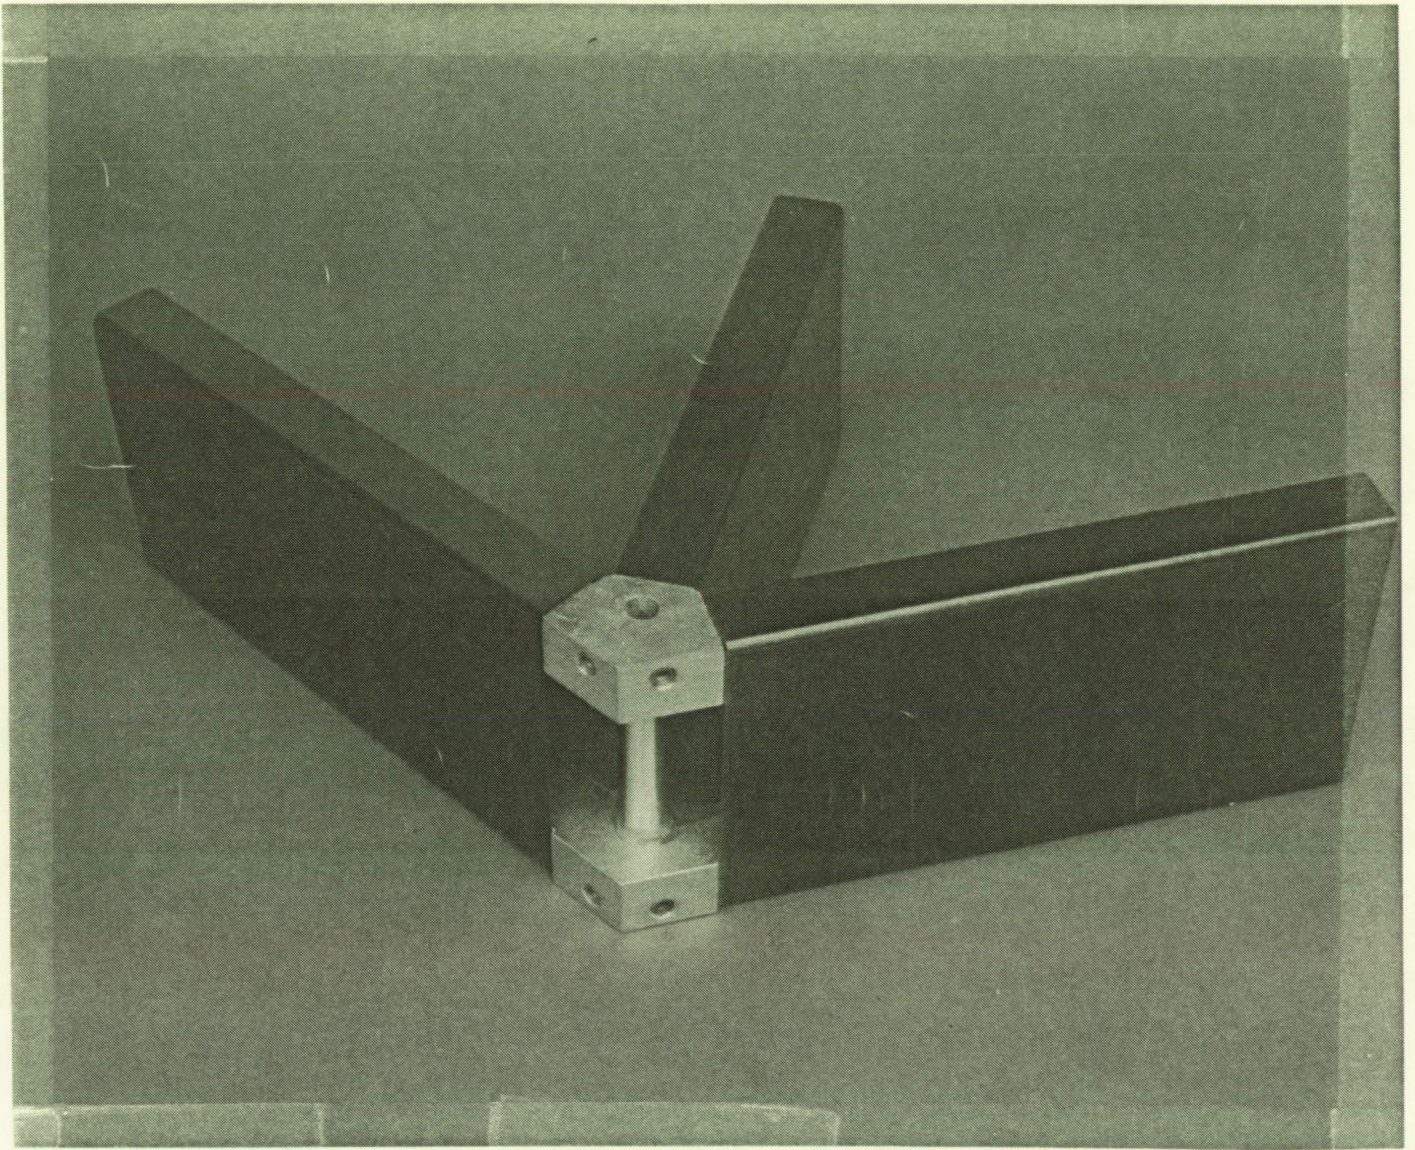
Actual Corner Fitting With Short Sections Of Box Beam In Place. The Shear Plate Is Removed To Allow Viewing Of The Fitting.
